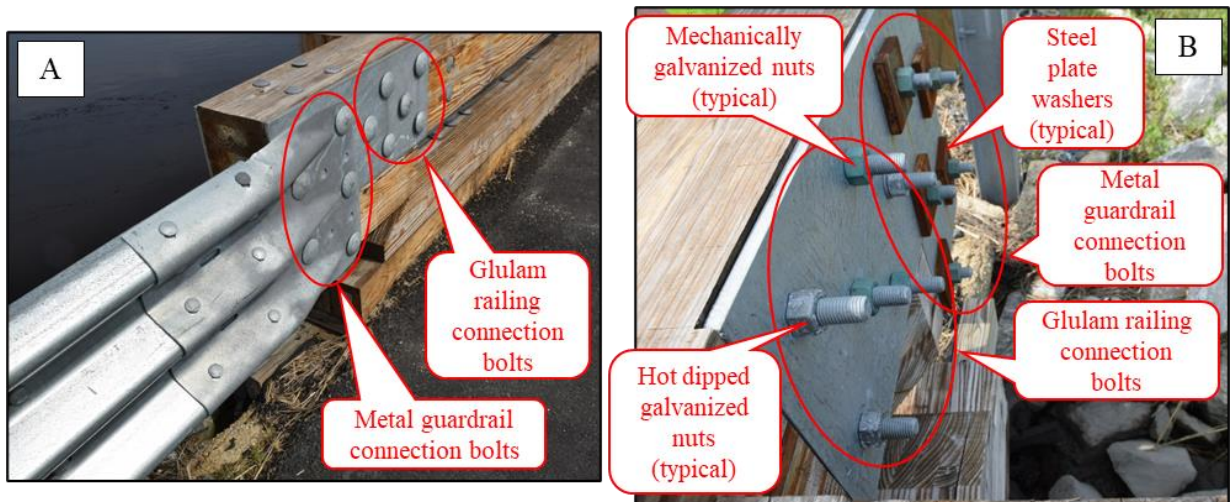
Photographs of Metal Guardrail to Glulam Railing Guardrail Connection on Southwest Corner of Bridge Showing Connection: (A) traffic side; (B) water side.
